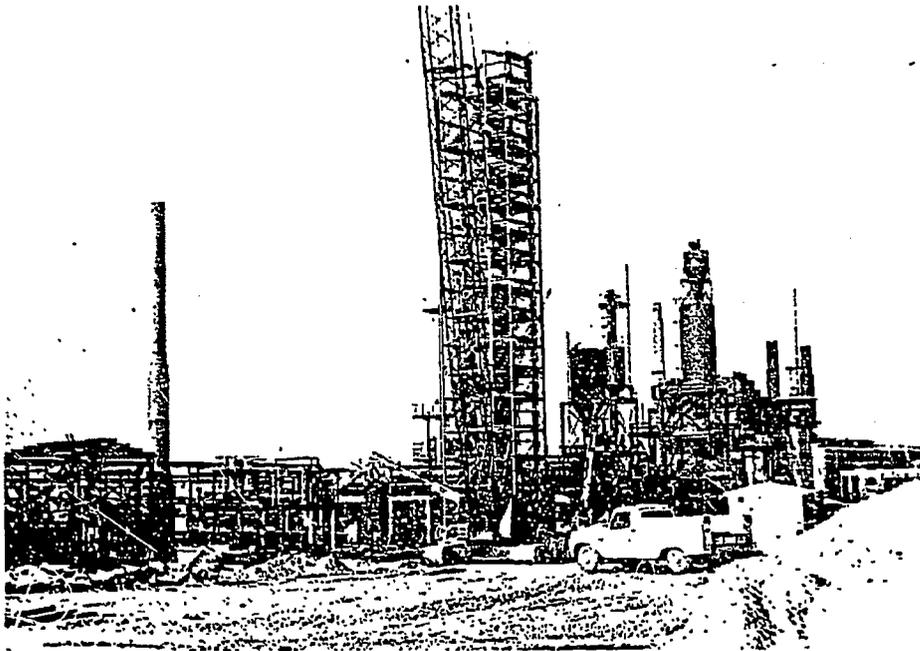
OVERALL PLANT LOOKING NORTHEAST
